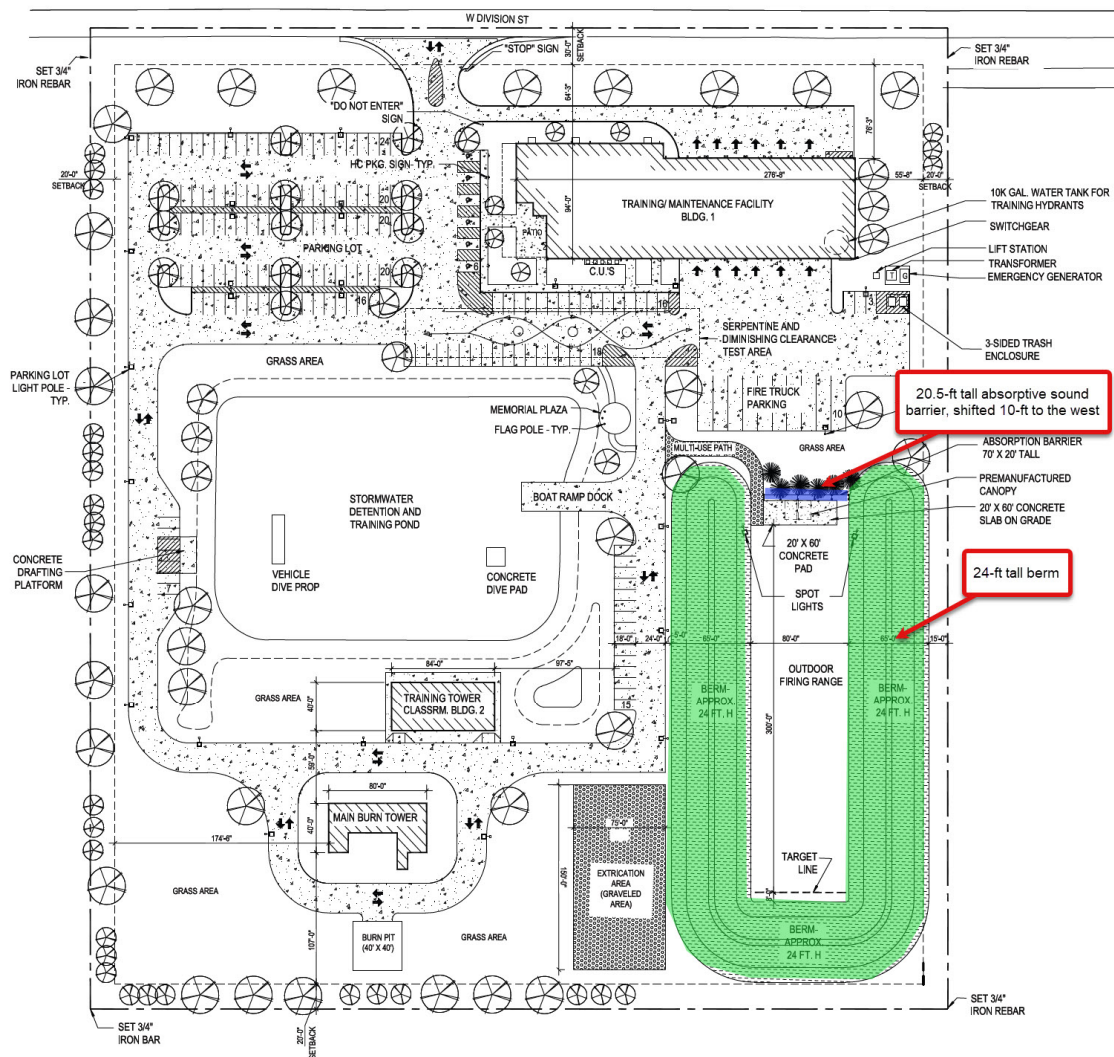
Site Plan for the Lockport Township FPD Training Grounds, Lockport, IL
